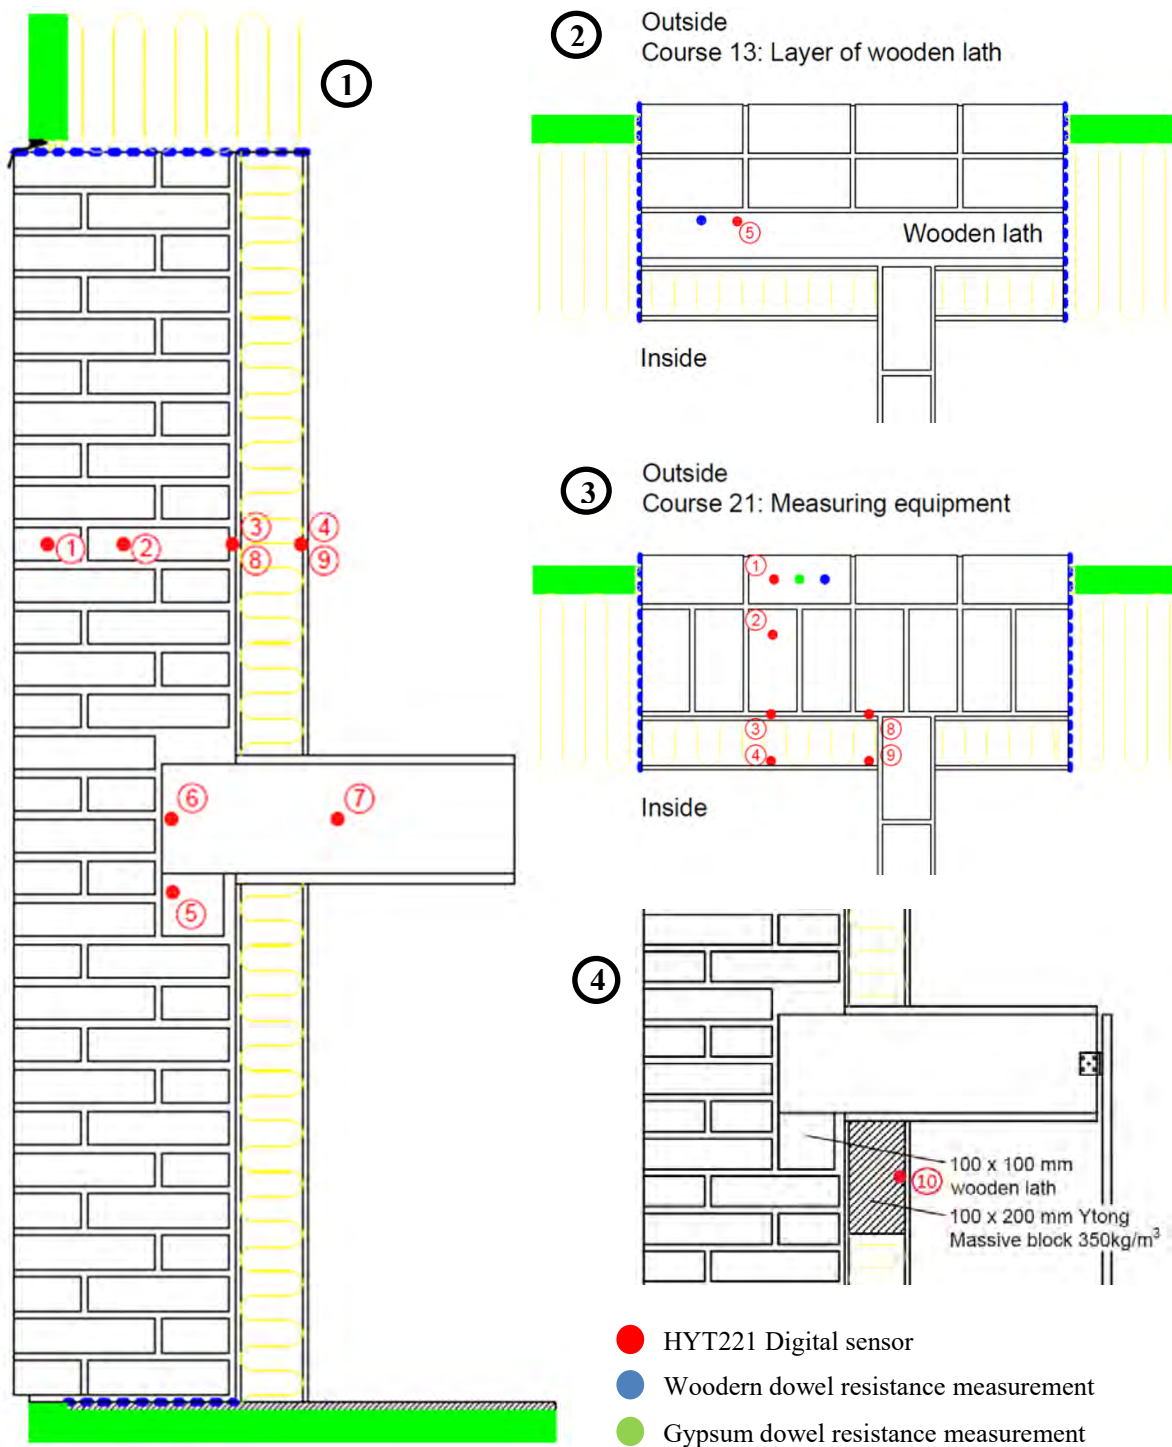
Sensor placement. 1) Vertical section showing sensor placement. 2) Horizontal section at masonry course 13 showing sensor placement. 3) Horizontal section at masonry course 21 showing sensor placement. 4) Vertical section showing sensor placement in AAC block below the floor structure.
